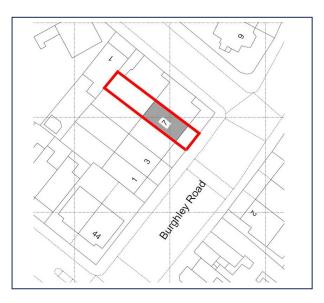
SITE LOCATION PLAN FOR REFERENCE ONLY
